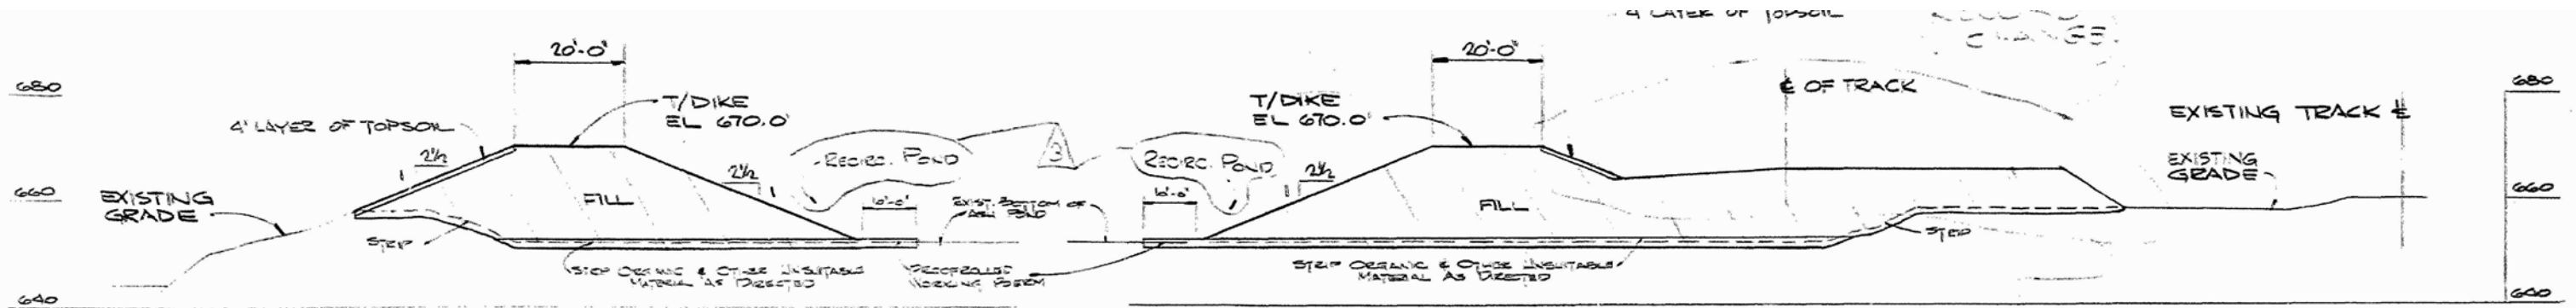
IMAGE REFERENCE: AMERICAN ELECTRIC POWER: SITE DEVELOPMENT ASH STORAGE AREA SECTIONS DRAWING NO. 3-3027-3
